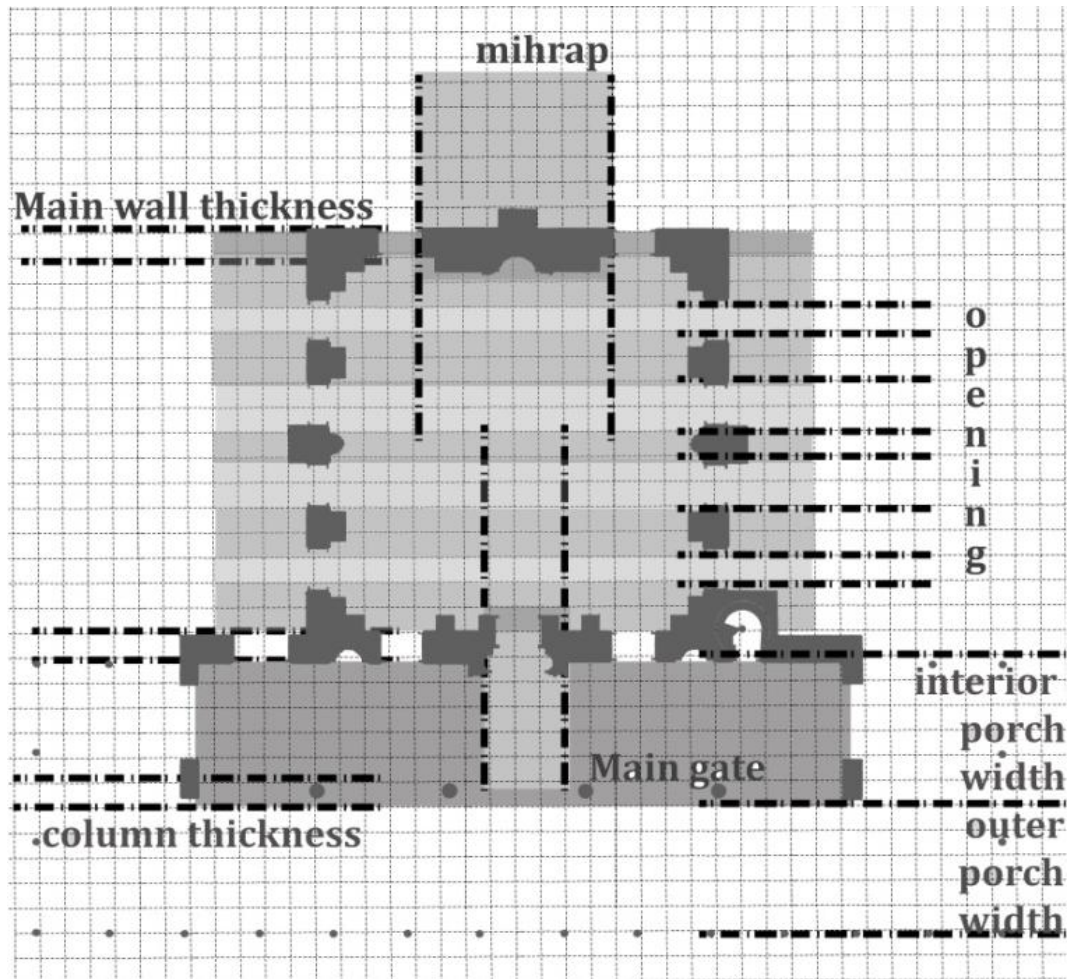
Conceptual diagram based on Rüstem Pasha Mosque floor plan
